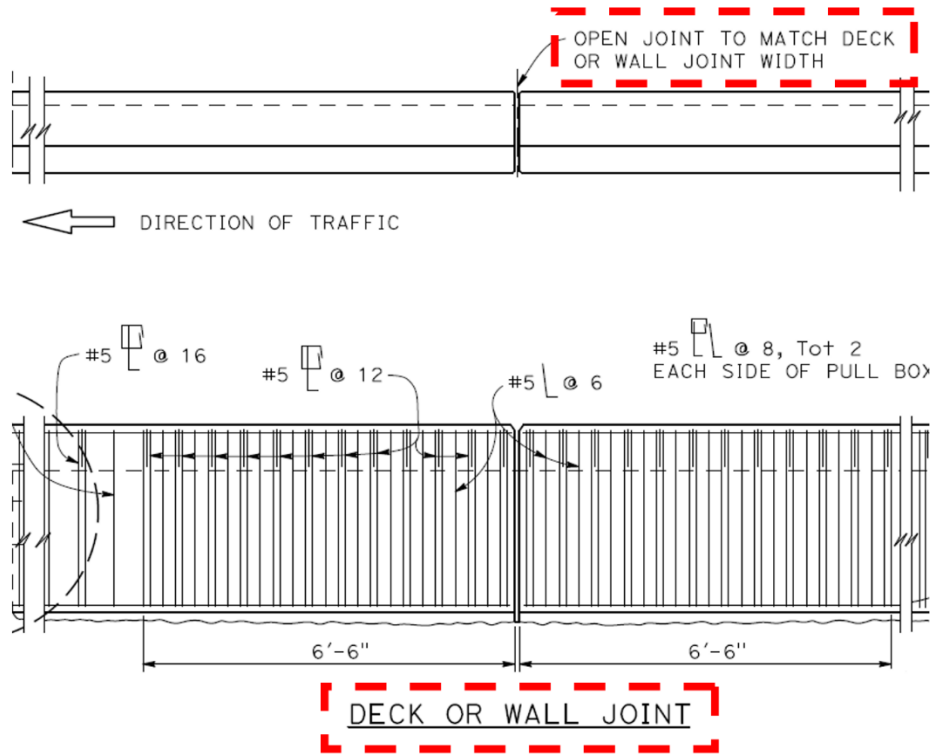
Standard Plan Detail Showing Type 836 Barrier Joint Matching Wall/Bridge Joint
